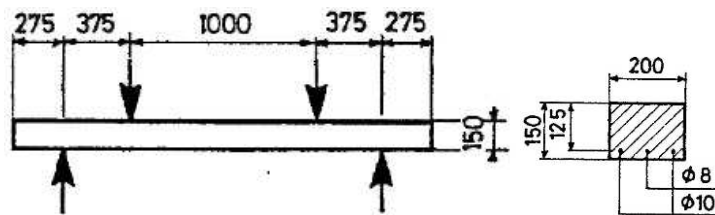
Dimensions and reinforcement bending beam tested by Walraven
